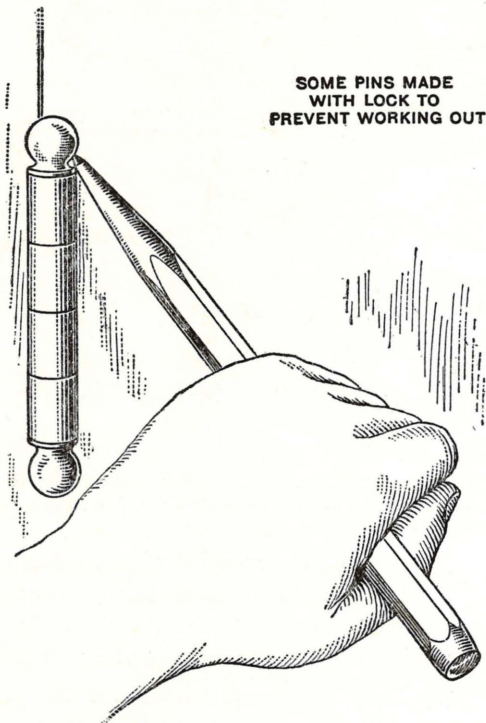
The hinge pin may be driven out with a center punch and a hammer
